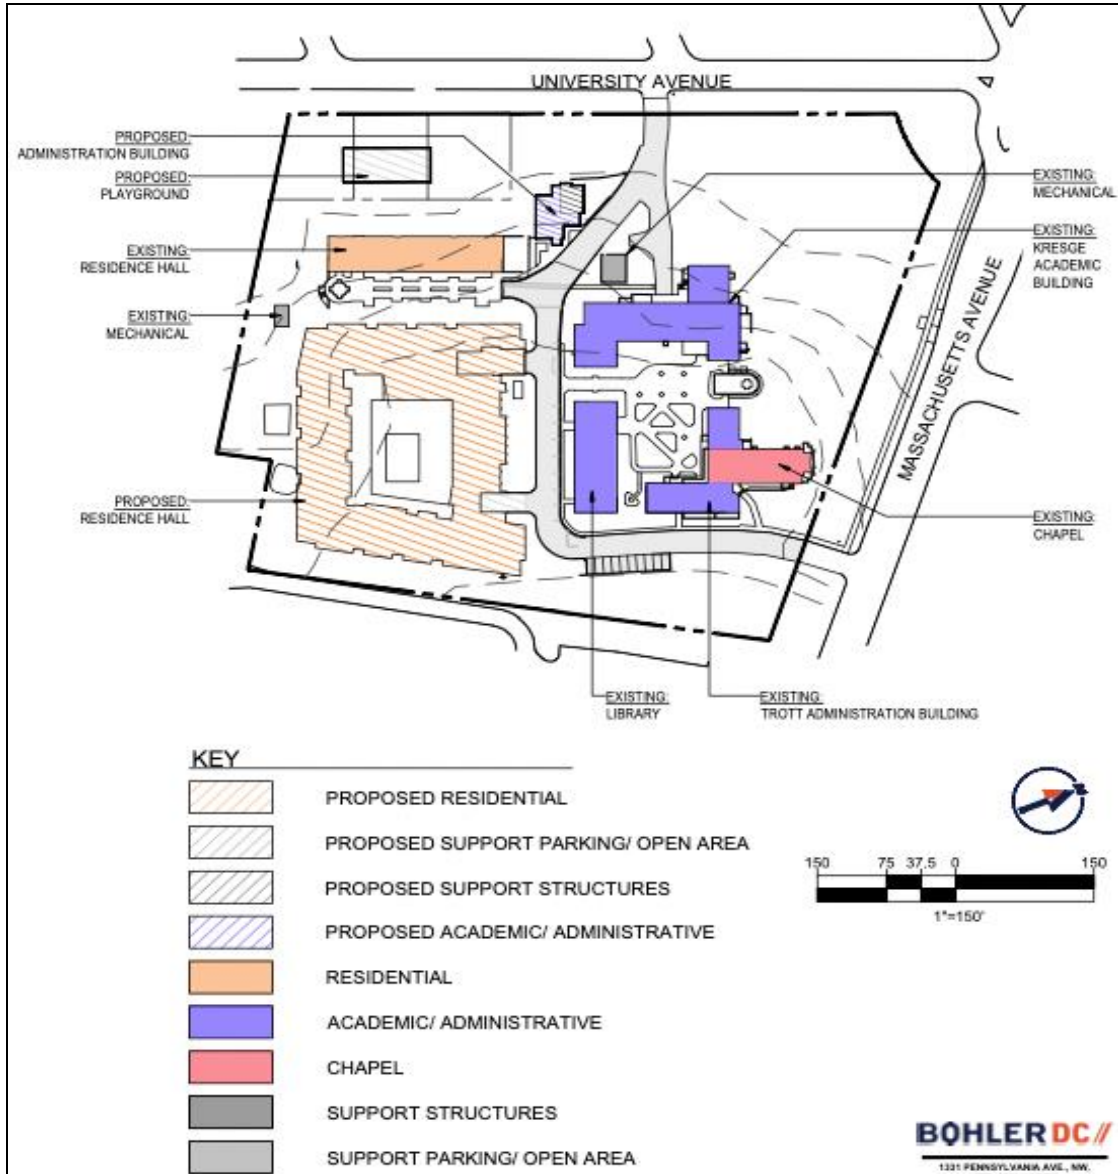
Proposed Campus Plan (case exhibit V ___). Proposed new construction is striped. Residences in the new dormitory would reflect current apartment-style co-living trends in campus housing.
